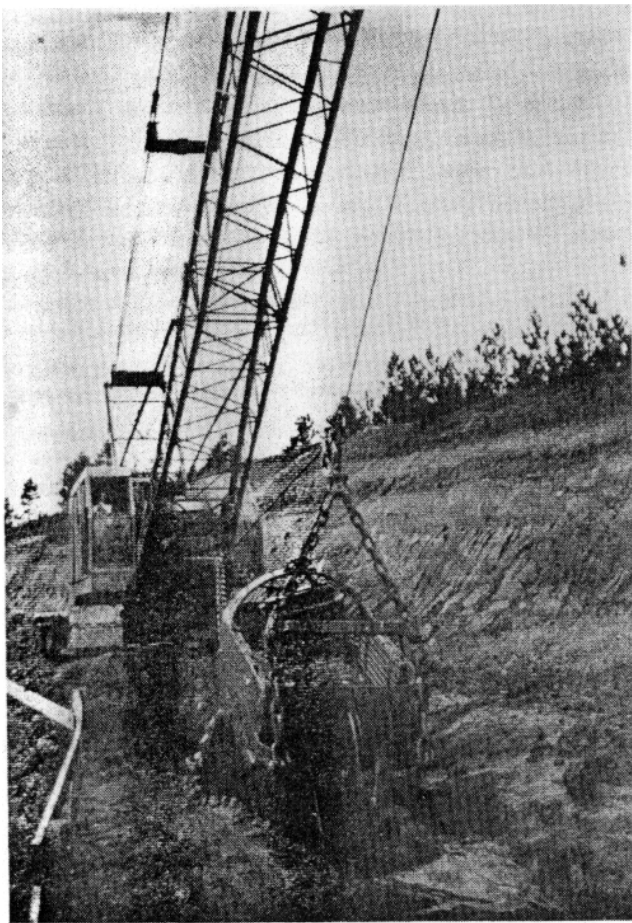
Dragline excavation of slurry trench, West Point Dam, Georgia
